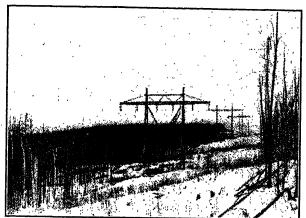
A Section of the Line Showing Type of Replacement Towers
